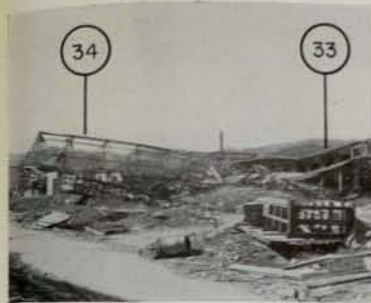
4,300 feet from GZ. Group 4. Buildings 33 and 34, looking southwest.
